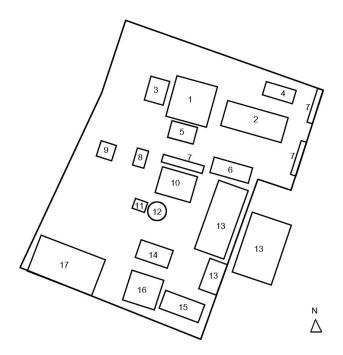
Plan of Wat Phra Kaeo Dontao Suchadaram compound.
